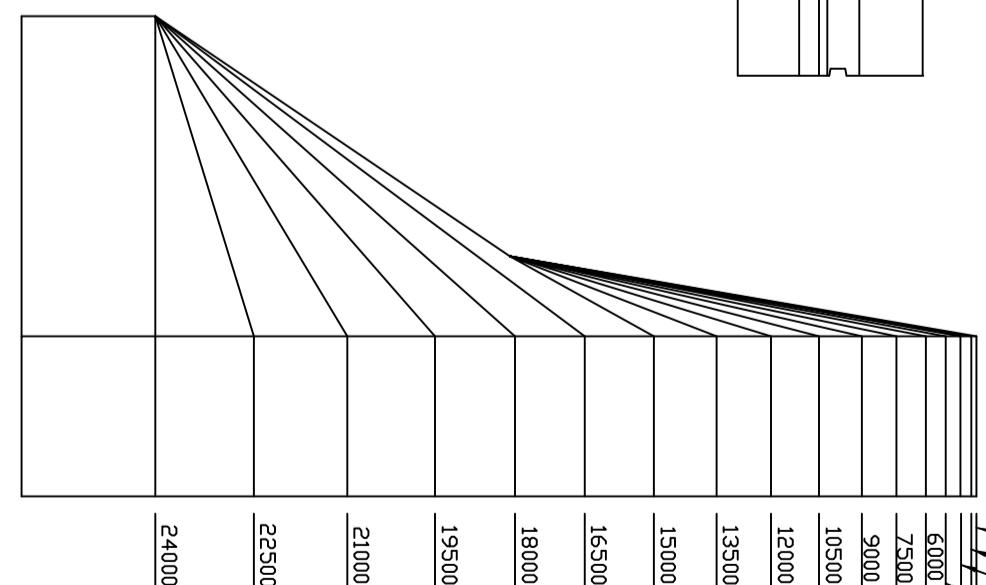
DETAIL SHOWING TRANSITION AT END OF INSTALLATION
